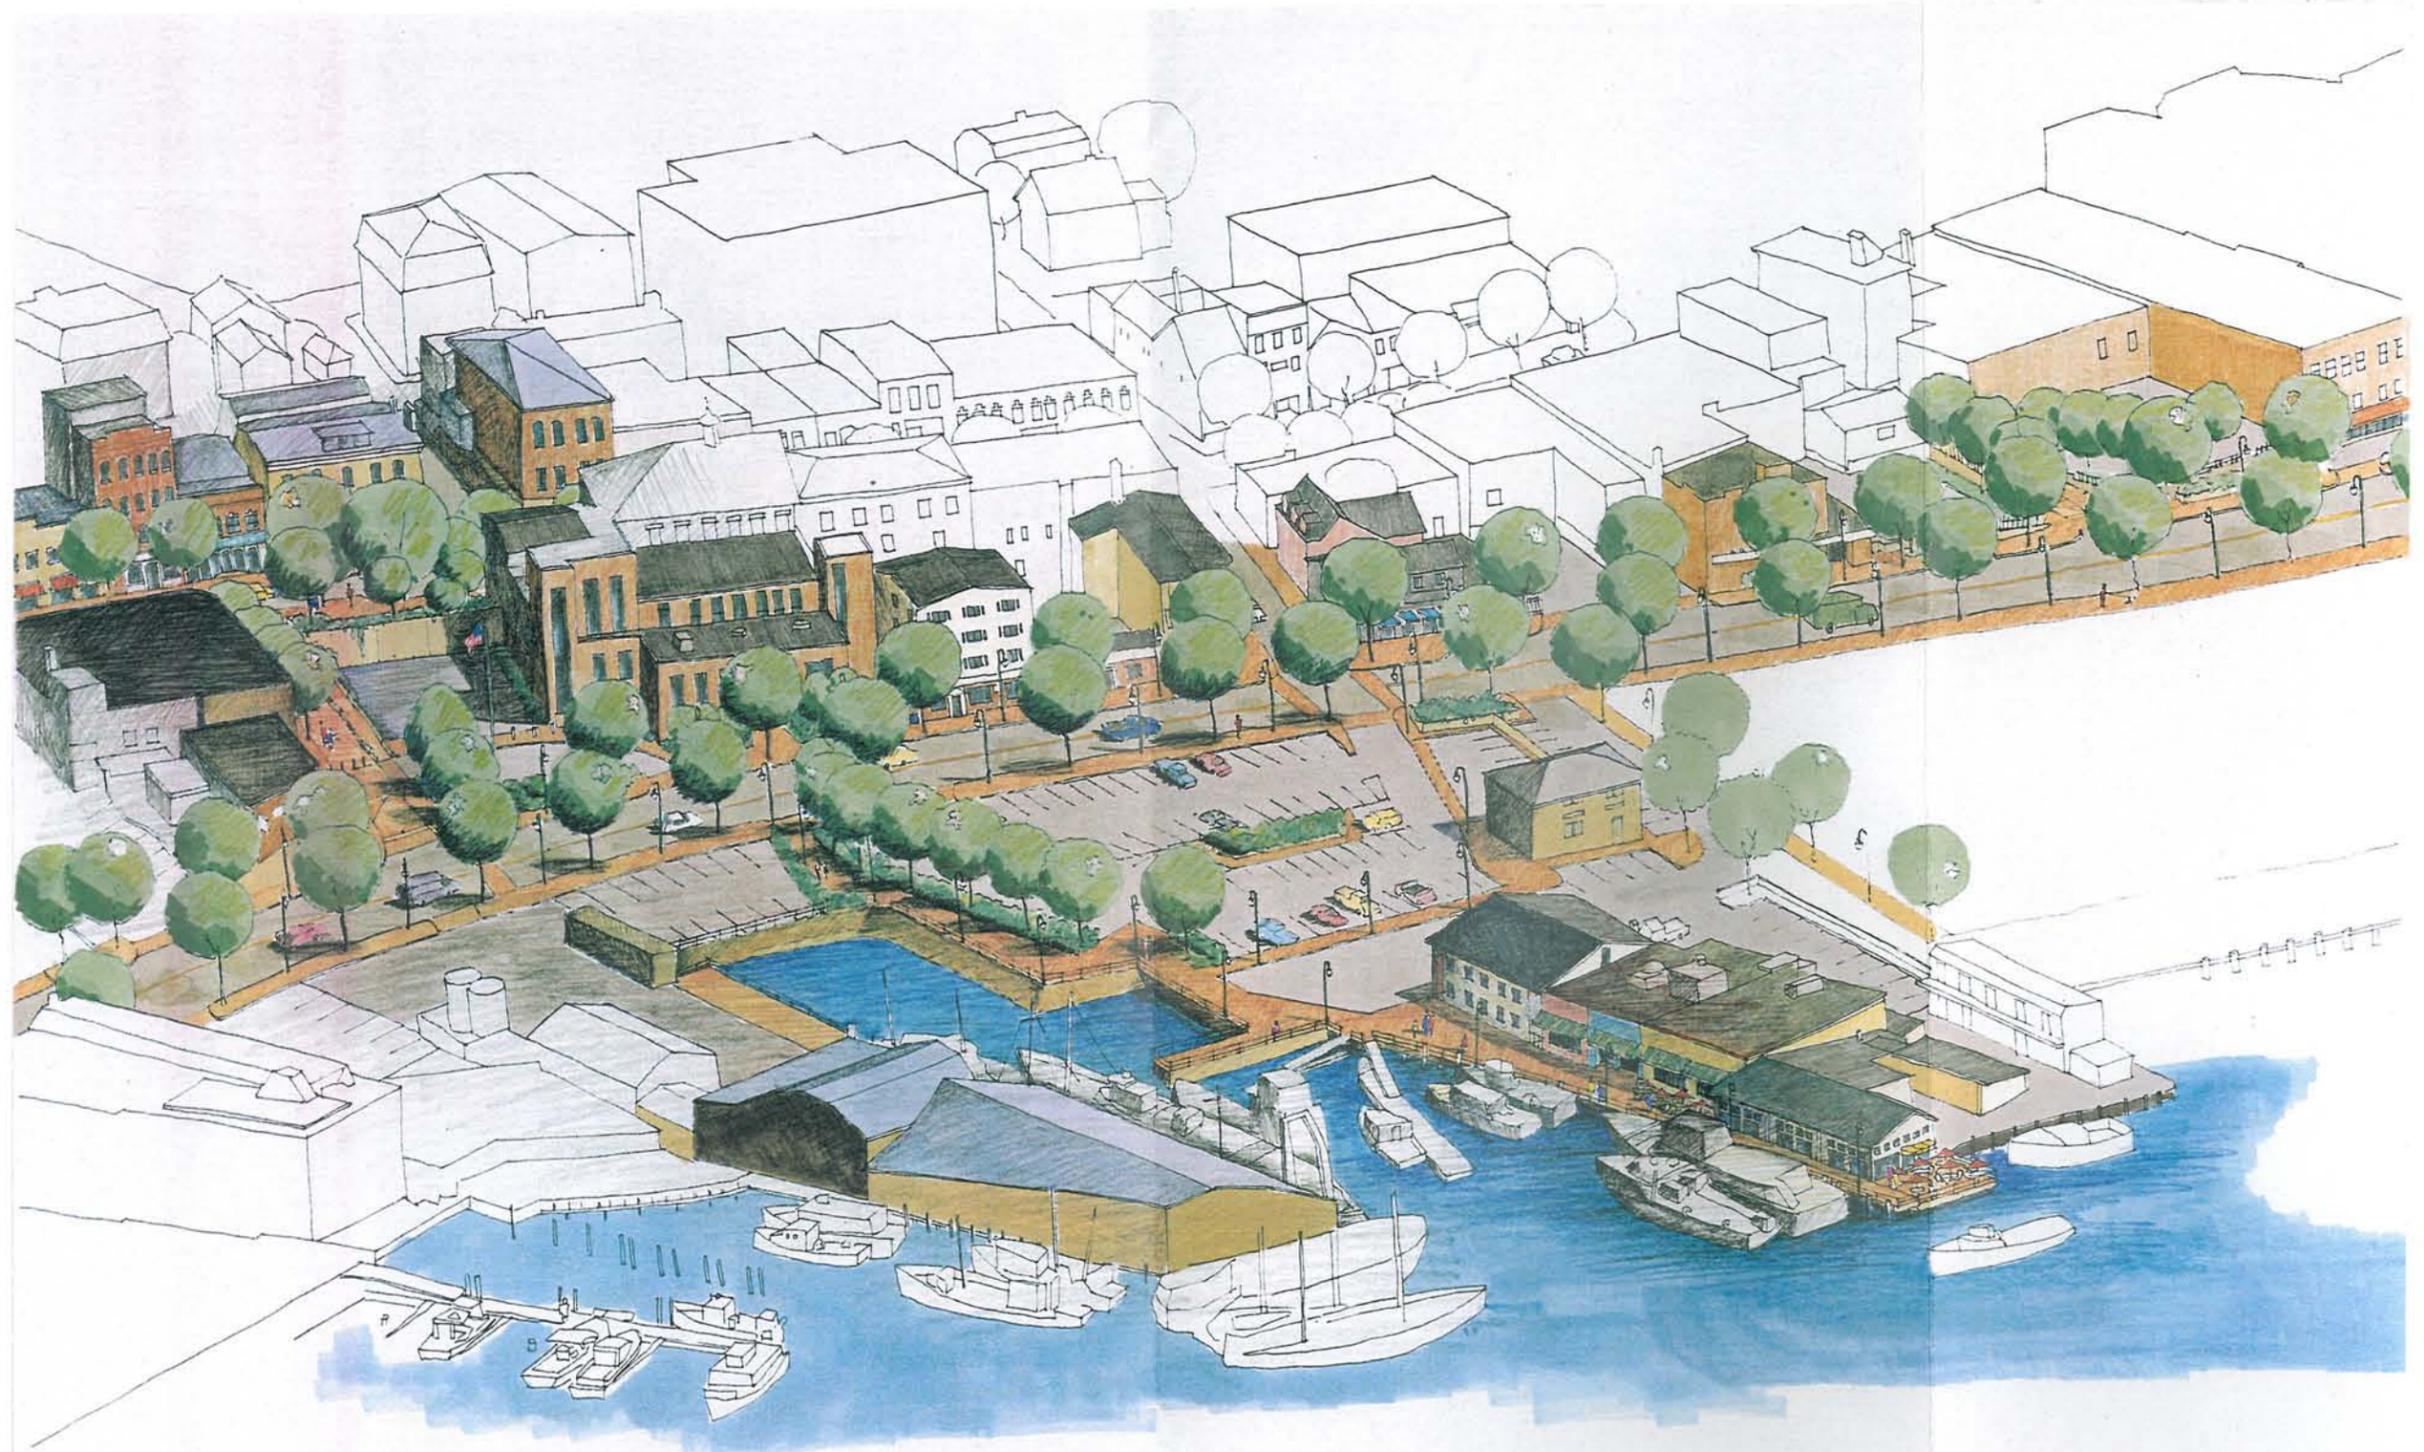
View at Rogers & Porter Street Looking East - Proposed Improvements
